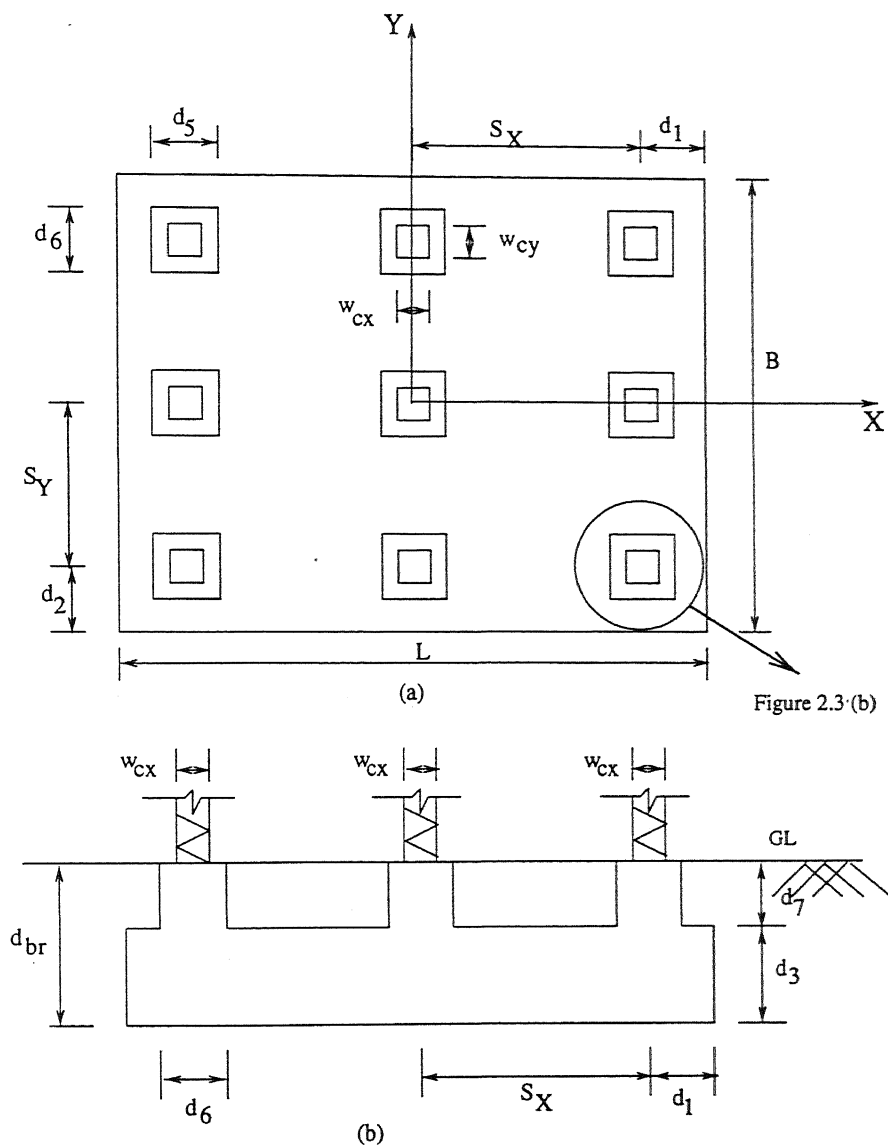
Raft for Steel super-structure, (a) plan, (b) elevation
